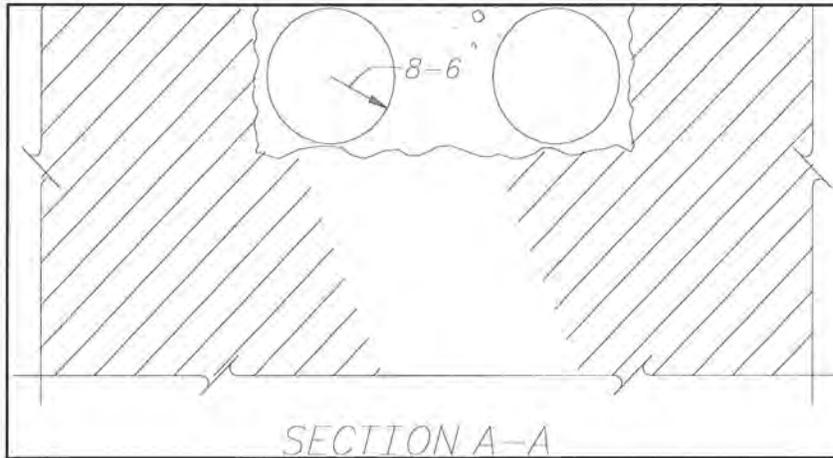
Upstream elevation view of the proposed excavated cross section to extend the mid-level outlets down the dam face to below the tailwater (alternative No. 2). (fn:extend.wp)
